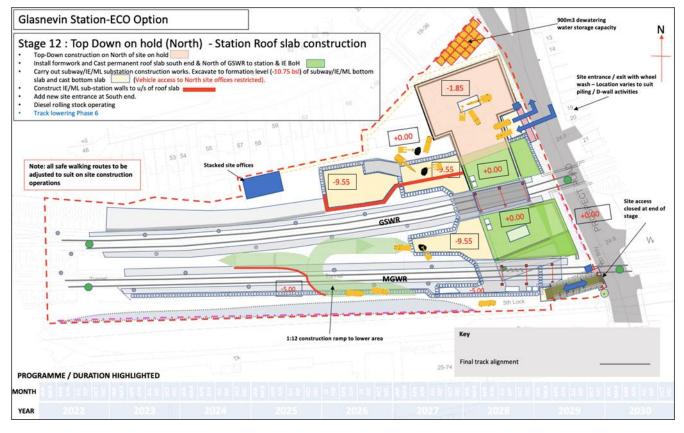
Top Down (North) - Station Roof Slab Construction
